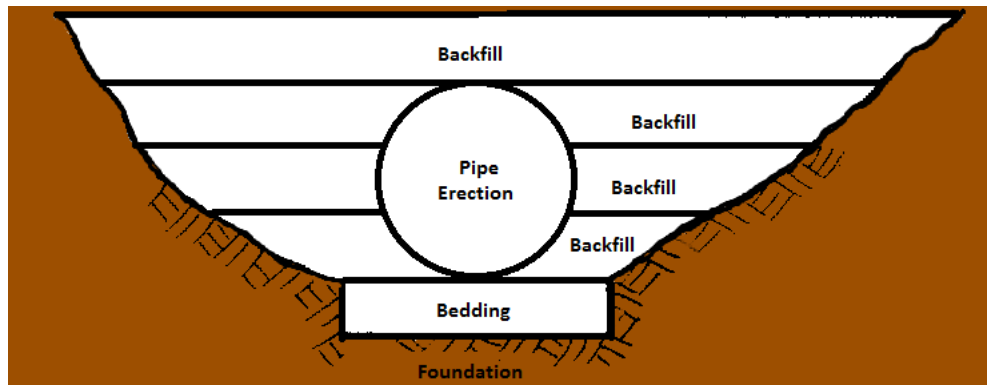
The sequence of construction of an underground pipe includes foundation preparation, bedding preparation, pipe erection, and backfilling in layers (Adapted from National Corrugated Steel Pipe Association. (2008). *Corrugated Steel Pipe Design Manual*. Dallas, TX.)
